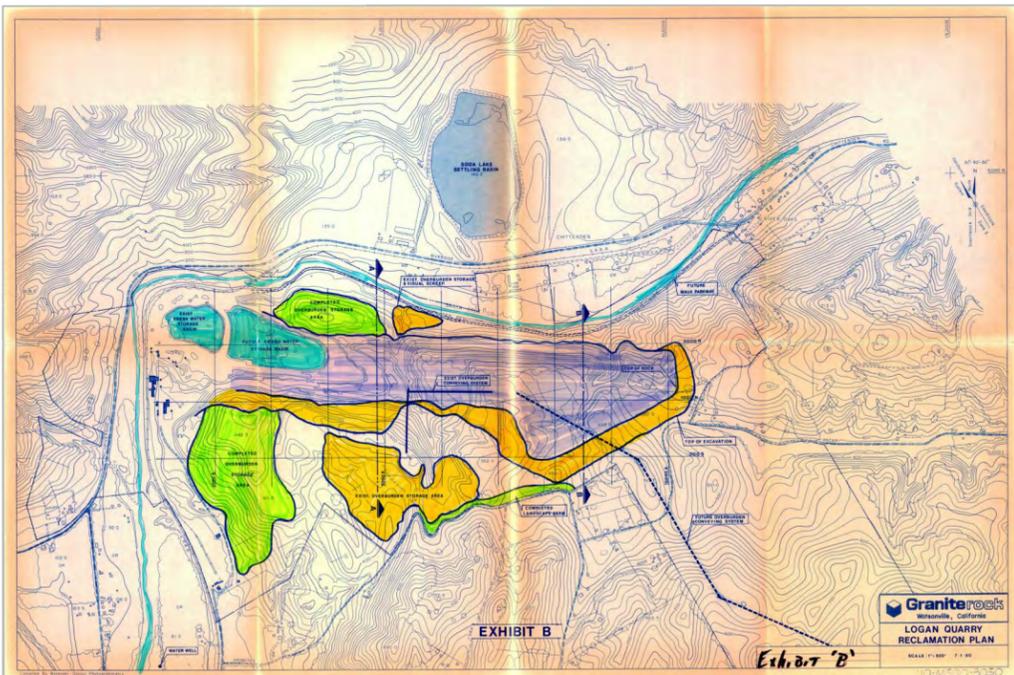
(b): EXHIBIT B - 1980 APPROVED REC PLAN
